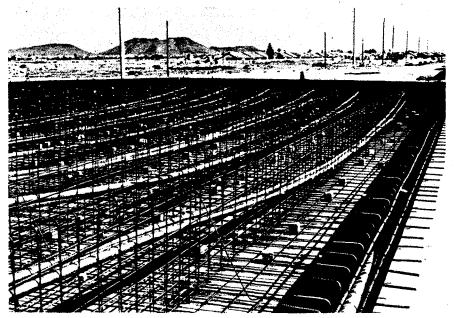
At-Grade Formwork With Posttensioning Ducts
